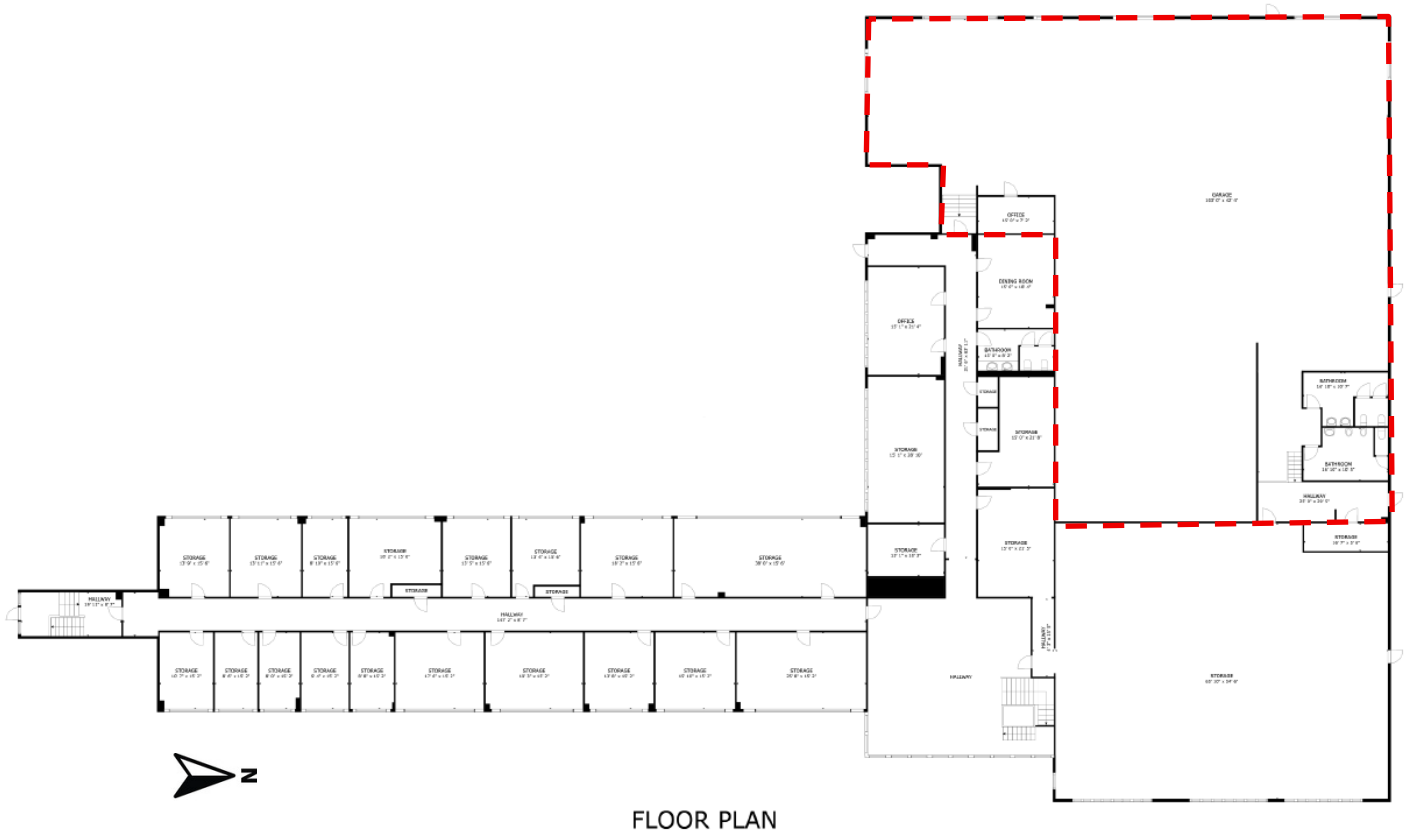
Typical plan for first and second floor. Dashed red line indicates location of modern addition. North arrow is approximate.
